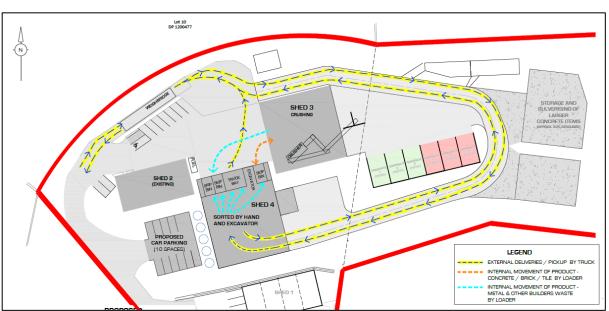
Plan 5A – Proposed Development Detail – Builders' Waste Source: Newton Denny Chapelle 2018
